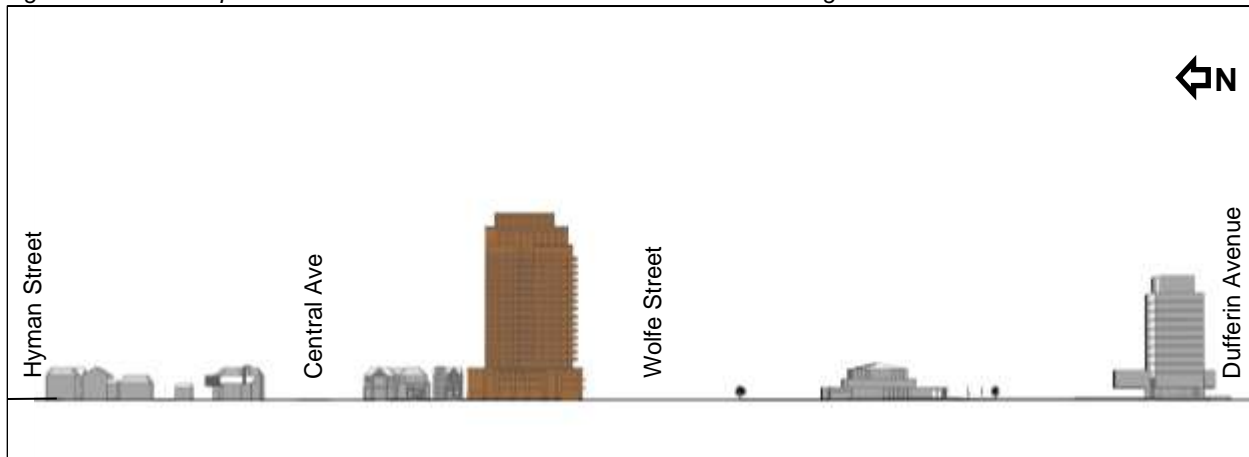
Streetscape Elevation – East side of Wellington Street between Hyman Street and Dufferin Avenue
